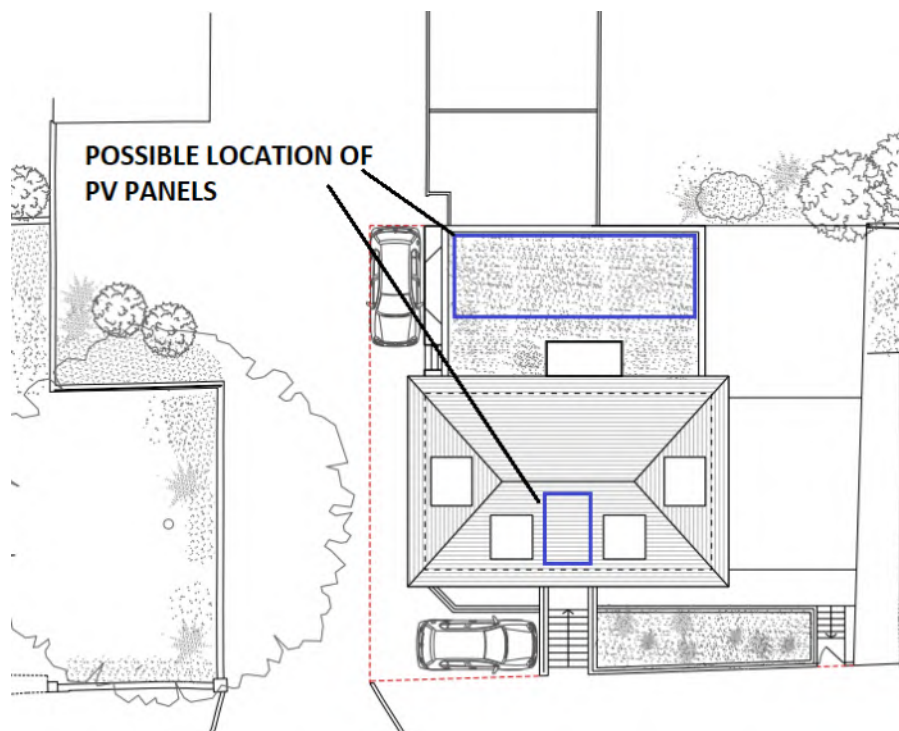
Location of the proposed PV system (source: Architect's plan)
